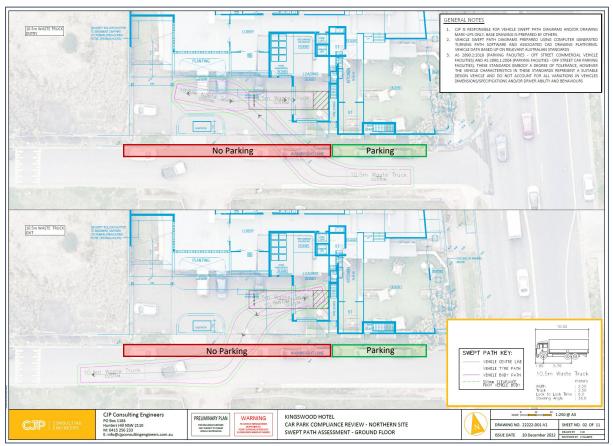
Option 1: On-site loading with required on-street parking restrictions in Wainwright Lane
